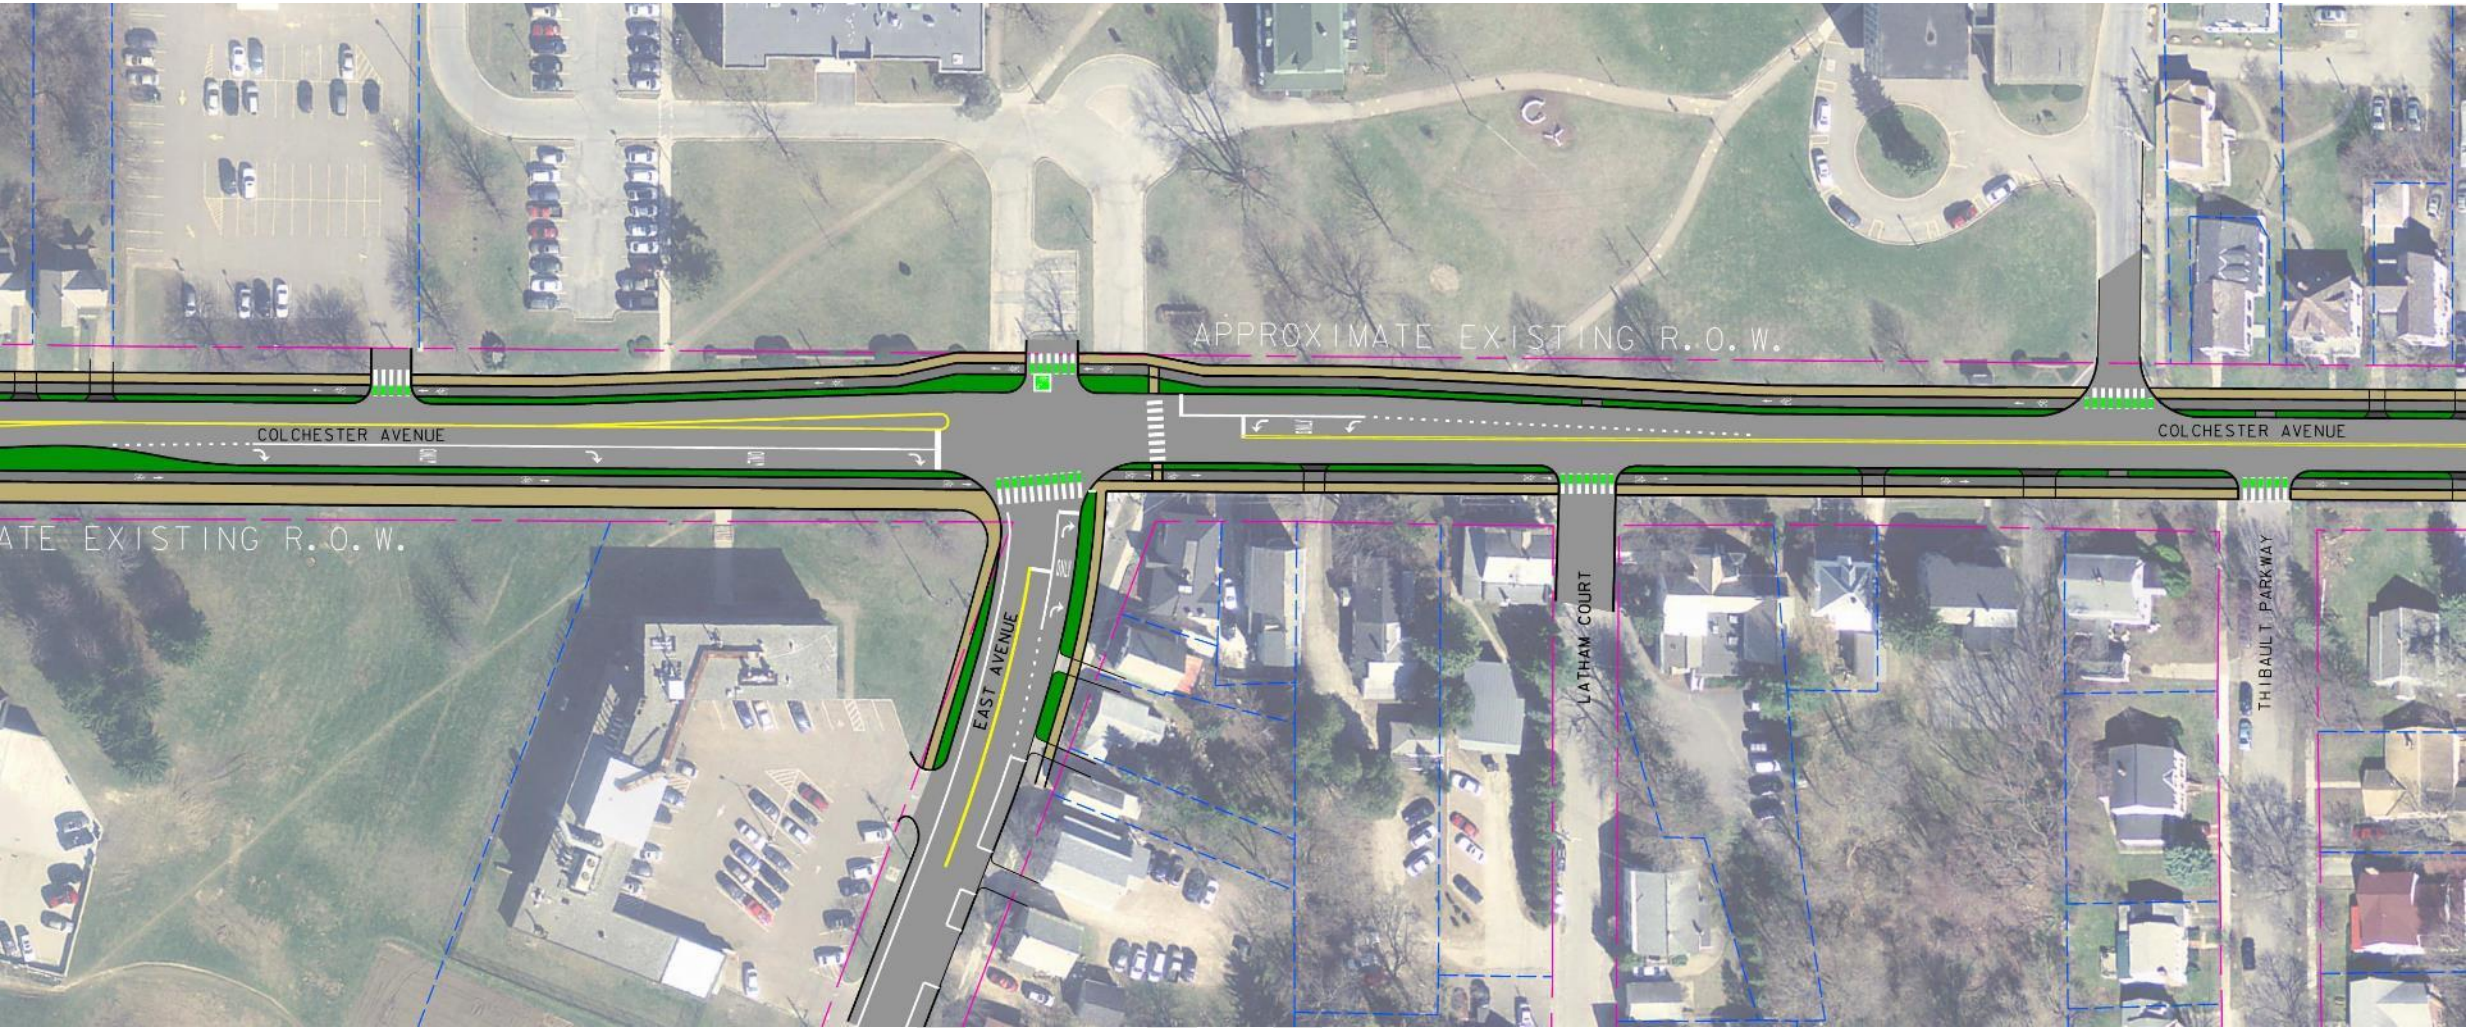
Colchester Ave & East Ave Intersection Alternative 2: Equipment and Striping Upgrades with Realignment of Intersection & New Bike Signal
